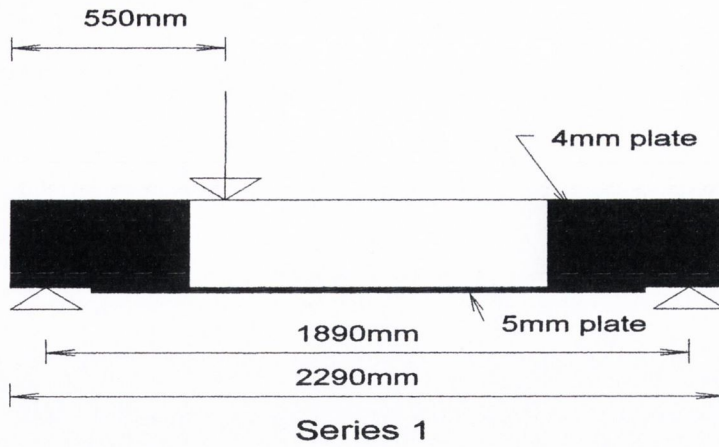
The configuration of beams tested with steel; shear and bending plates attached. (Oehlers et al 1998)
